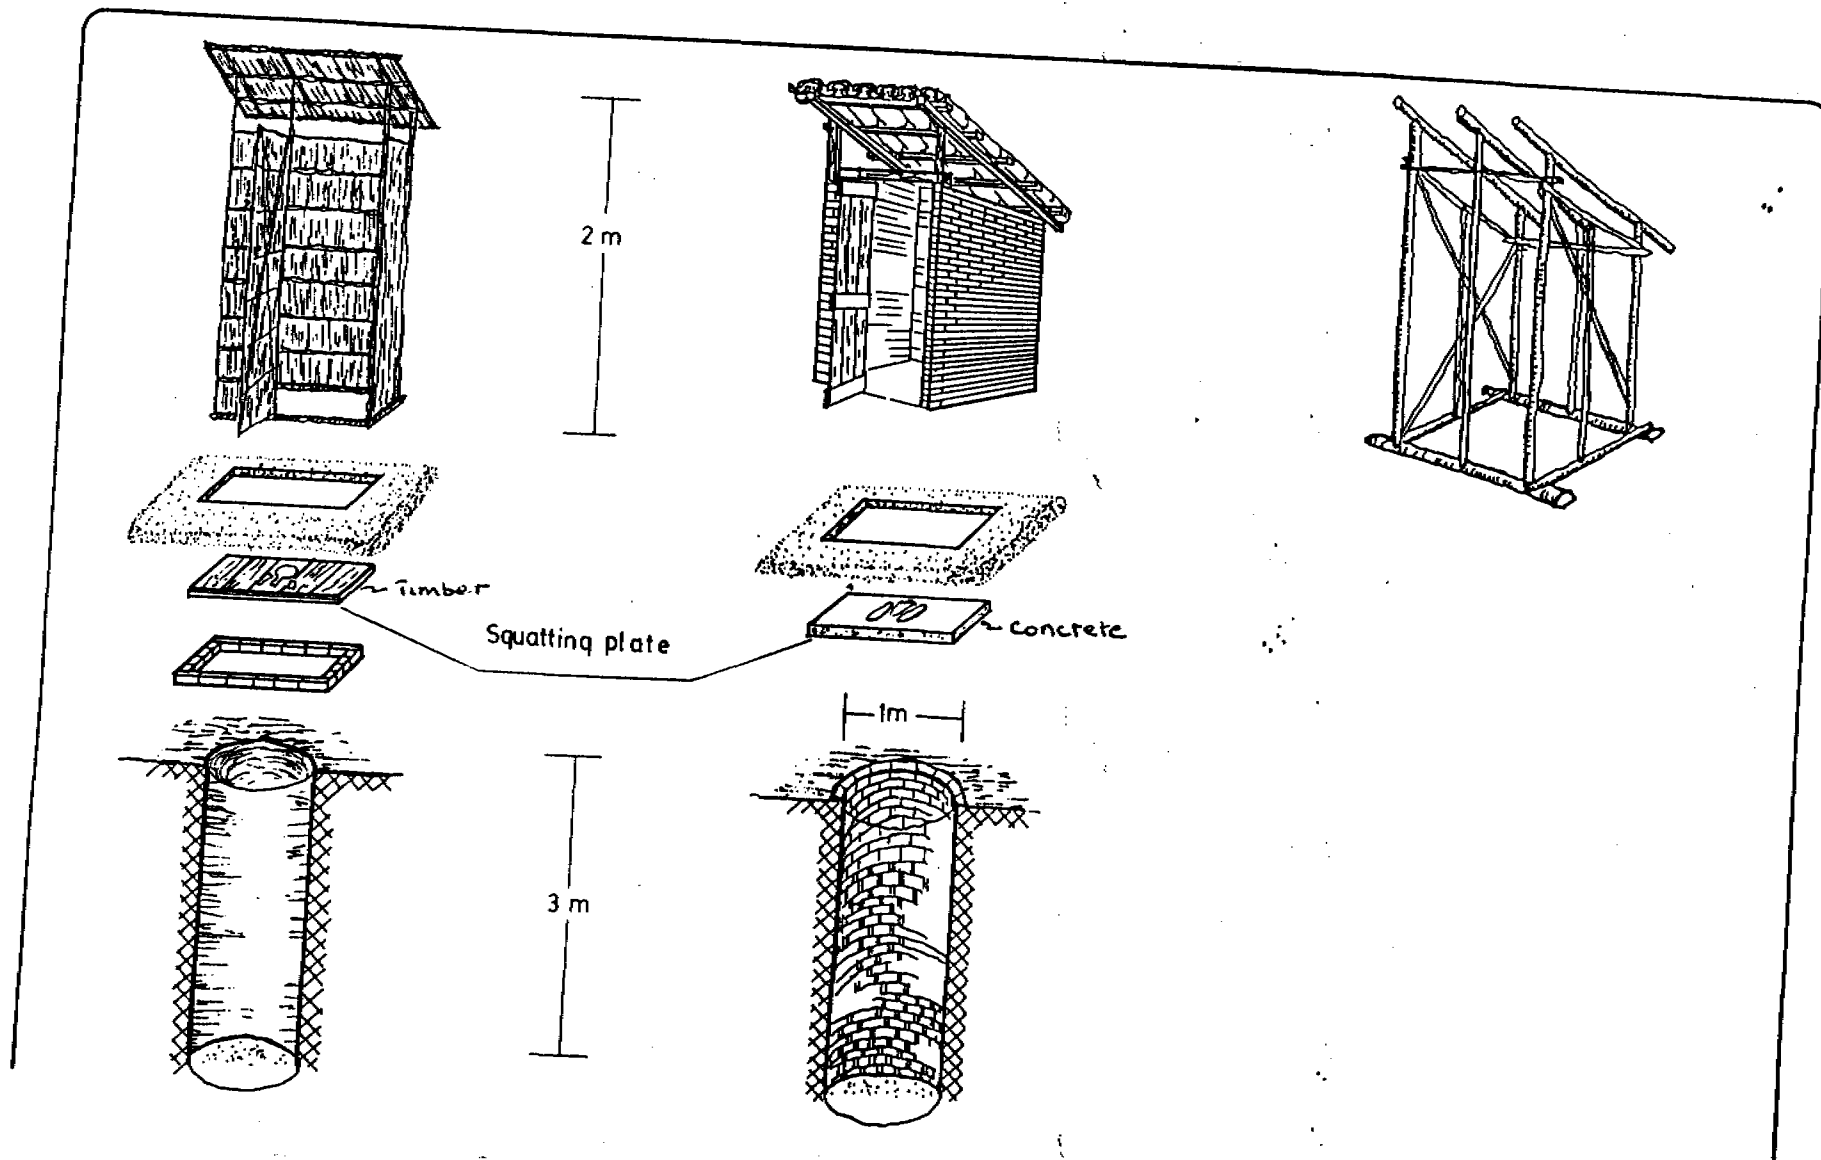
PIT LATRINE SLABS AND SUPERSTRUCTURE CONSTRUCTION.
